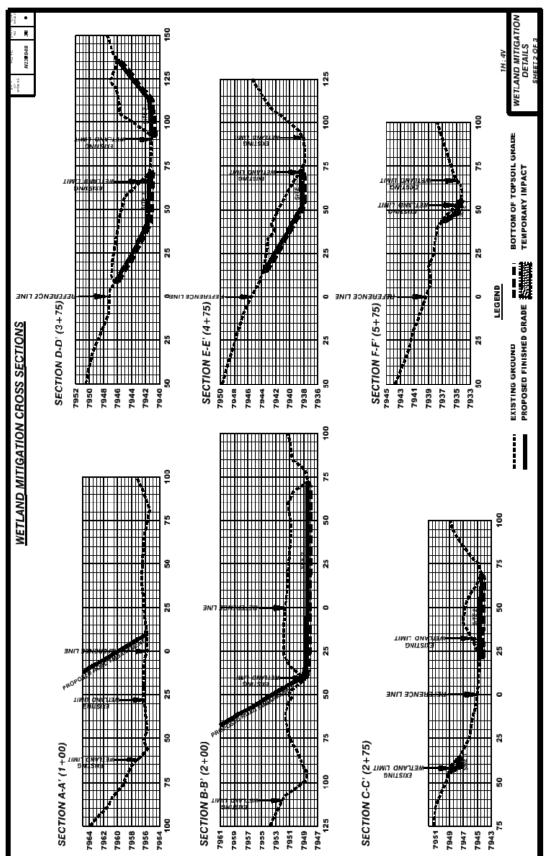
PROFILE AND CROSS SECTION VIEW
